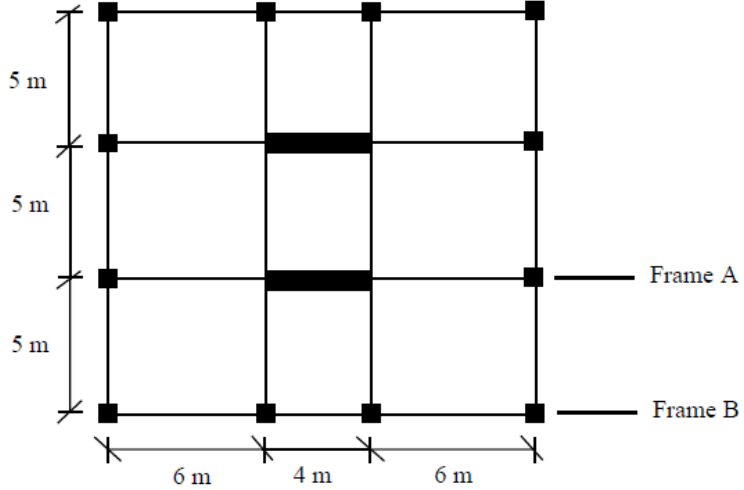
Story plan of the twelve story R/C wall-frame building
